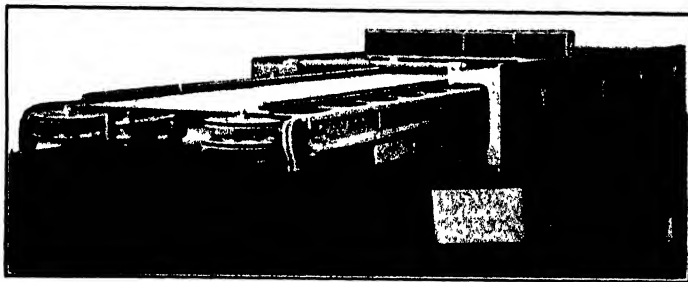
Stoney gate for Assuan dam. Sluice frame, with sluice entering, showing rollers, pulleys, etc.
